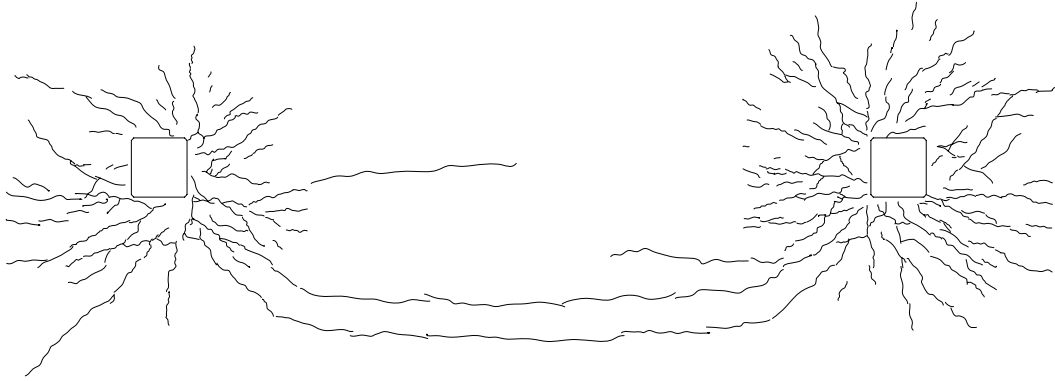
Level 3-2A and 2B Top Slab Cracks (North 1.5% Roof Drift)
